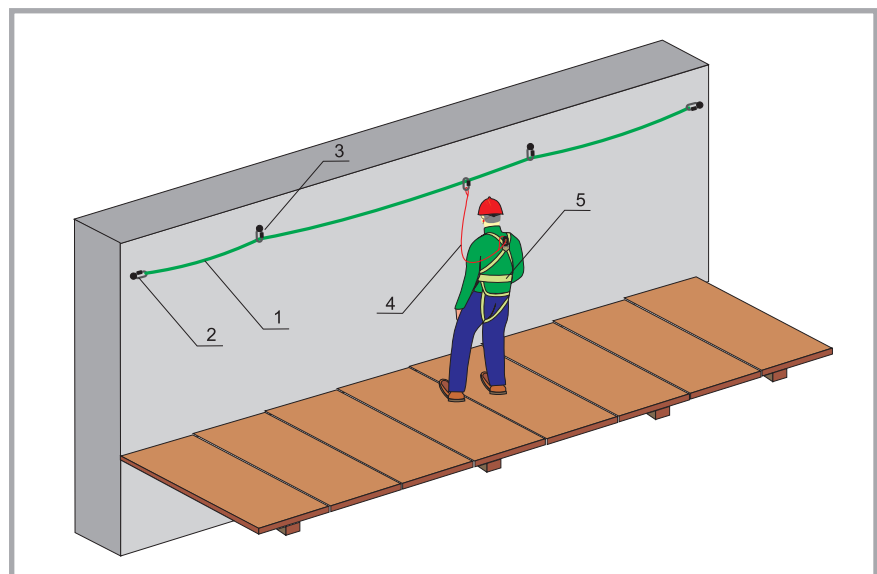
Fall protection system enabling workers to move horizontally: 1 – horizontal anchor line, 2 – extremity anchor point, 3 – intermediate anchor point, 4 – lanyard, 5 – full body harness.
